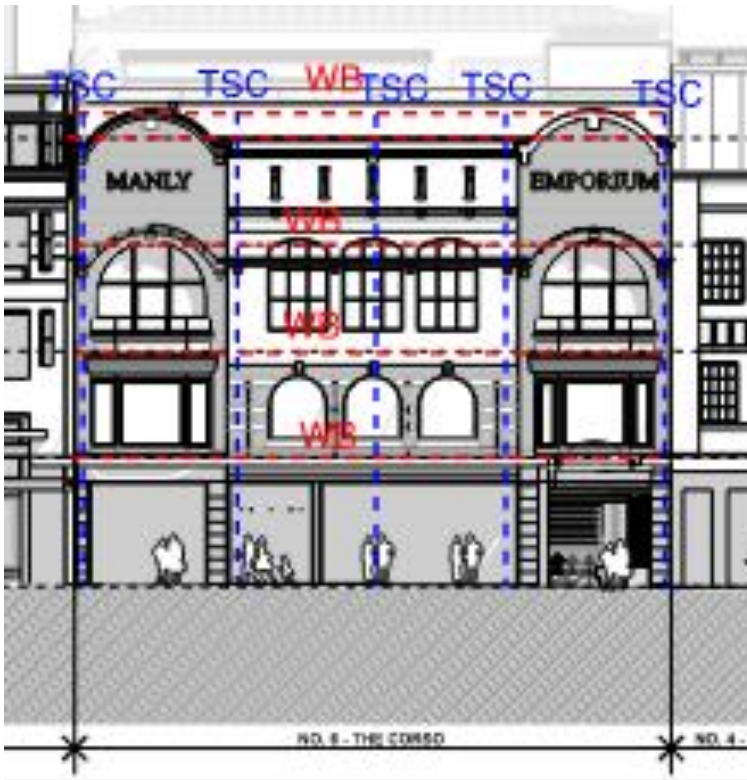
The location of the temporary steel column and the waler beams shown internally on the elevation.
